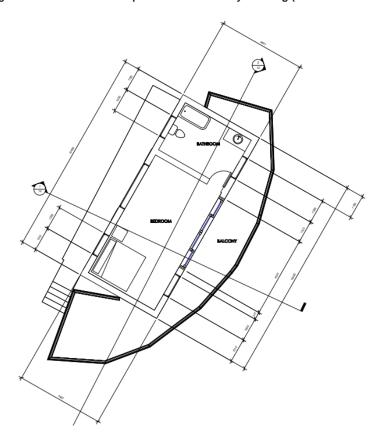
First floor plan of the secondary dwelling (Source: RCD Projects)
